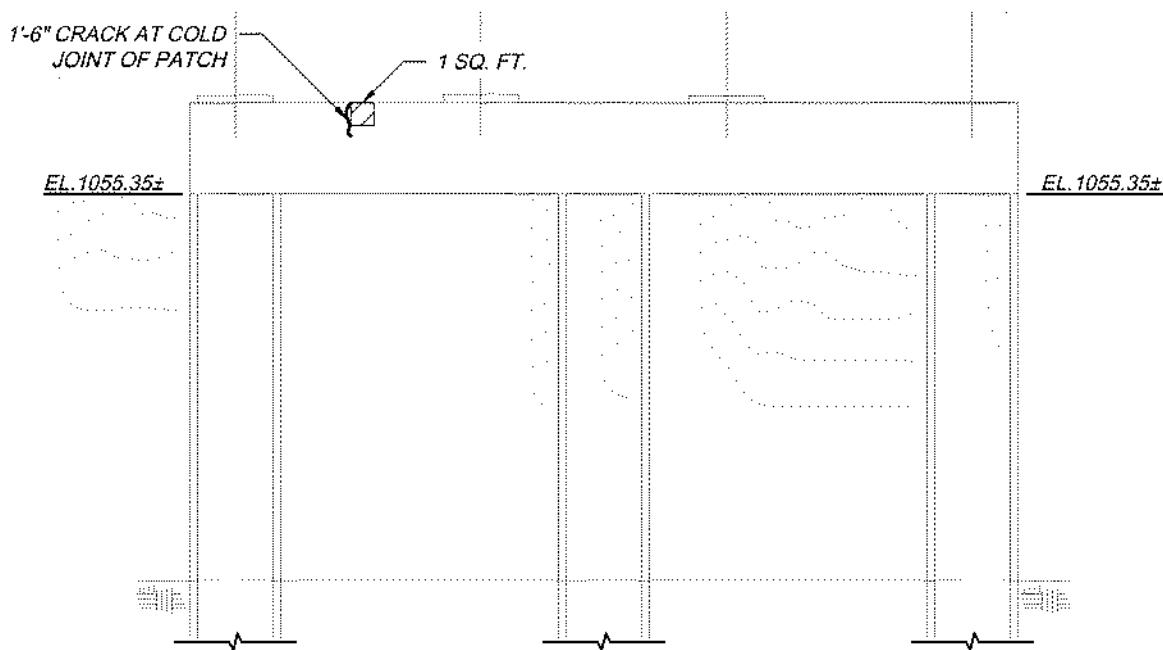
Location of Proposed Concrete Repairs - Pier 1 Upstation (South) Face Elevation MP 182.1
